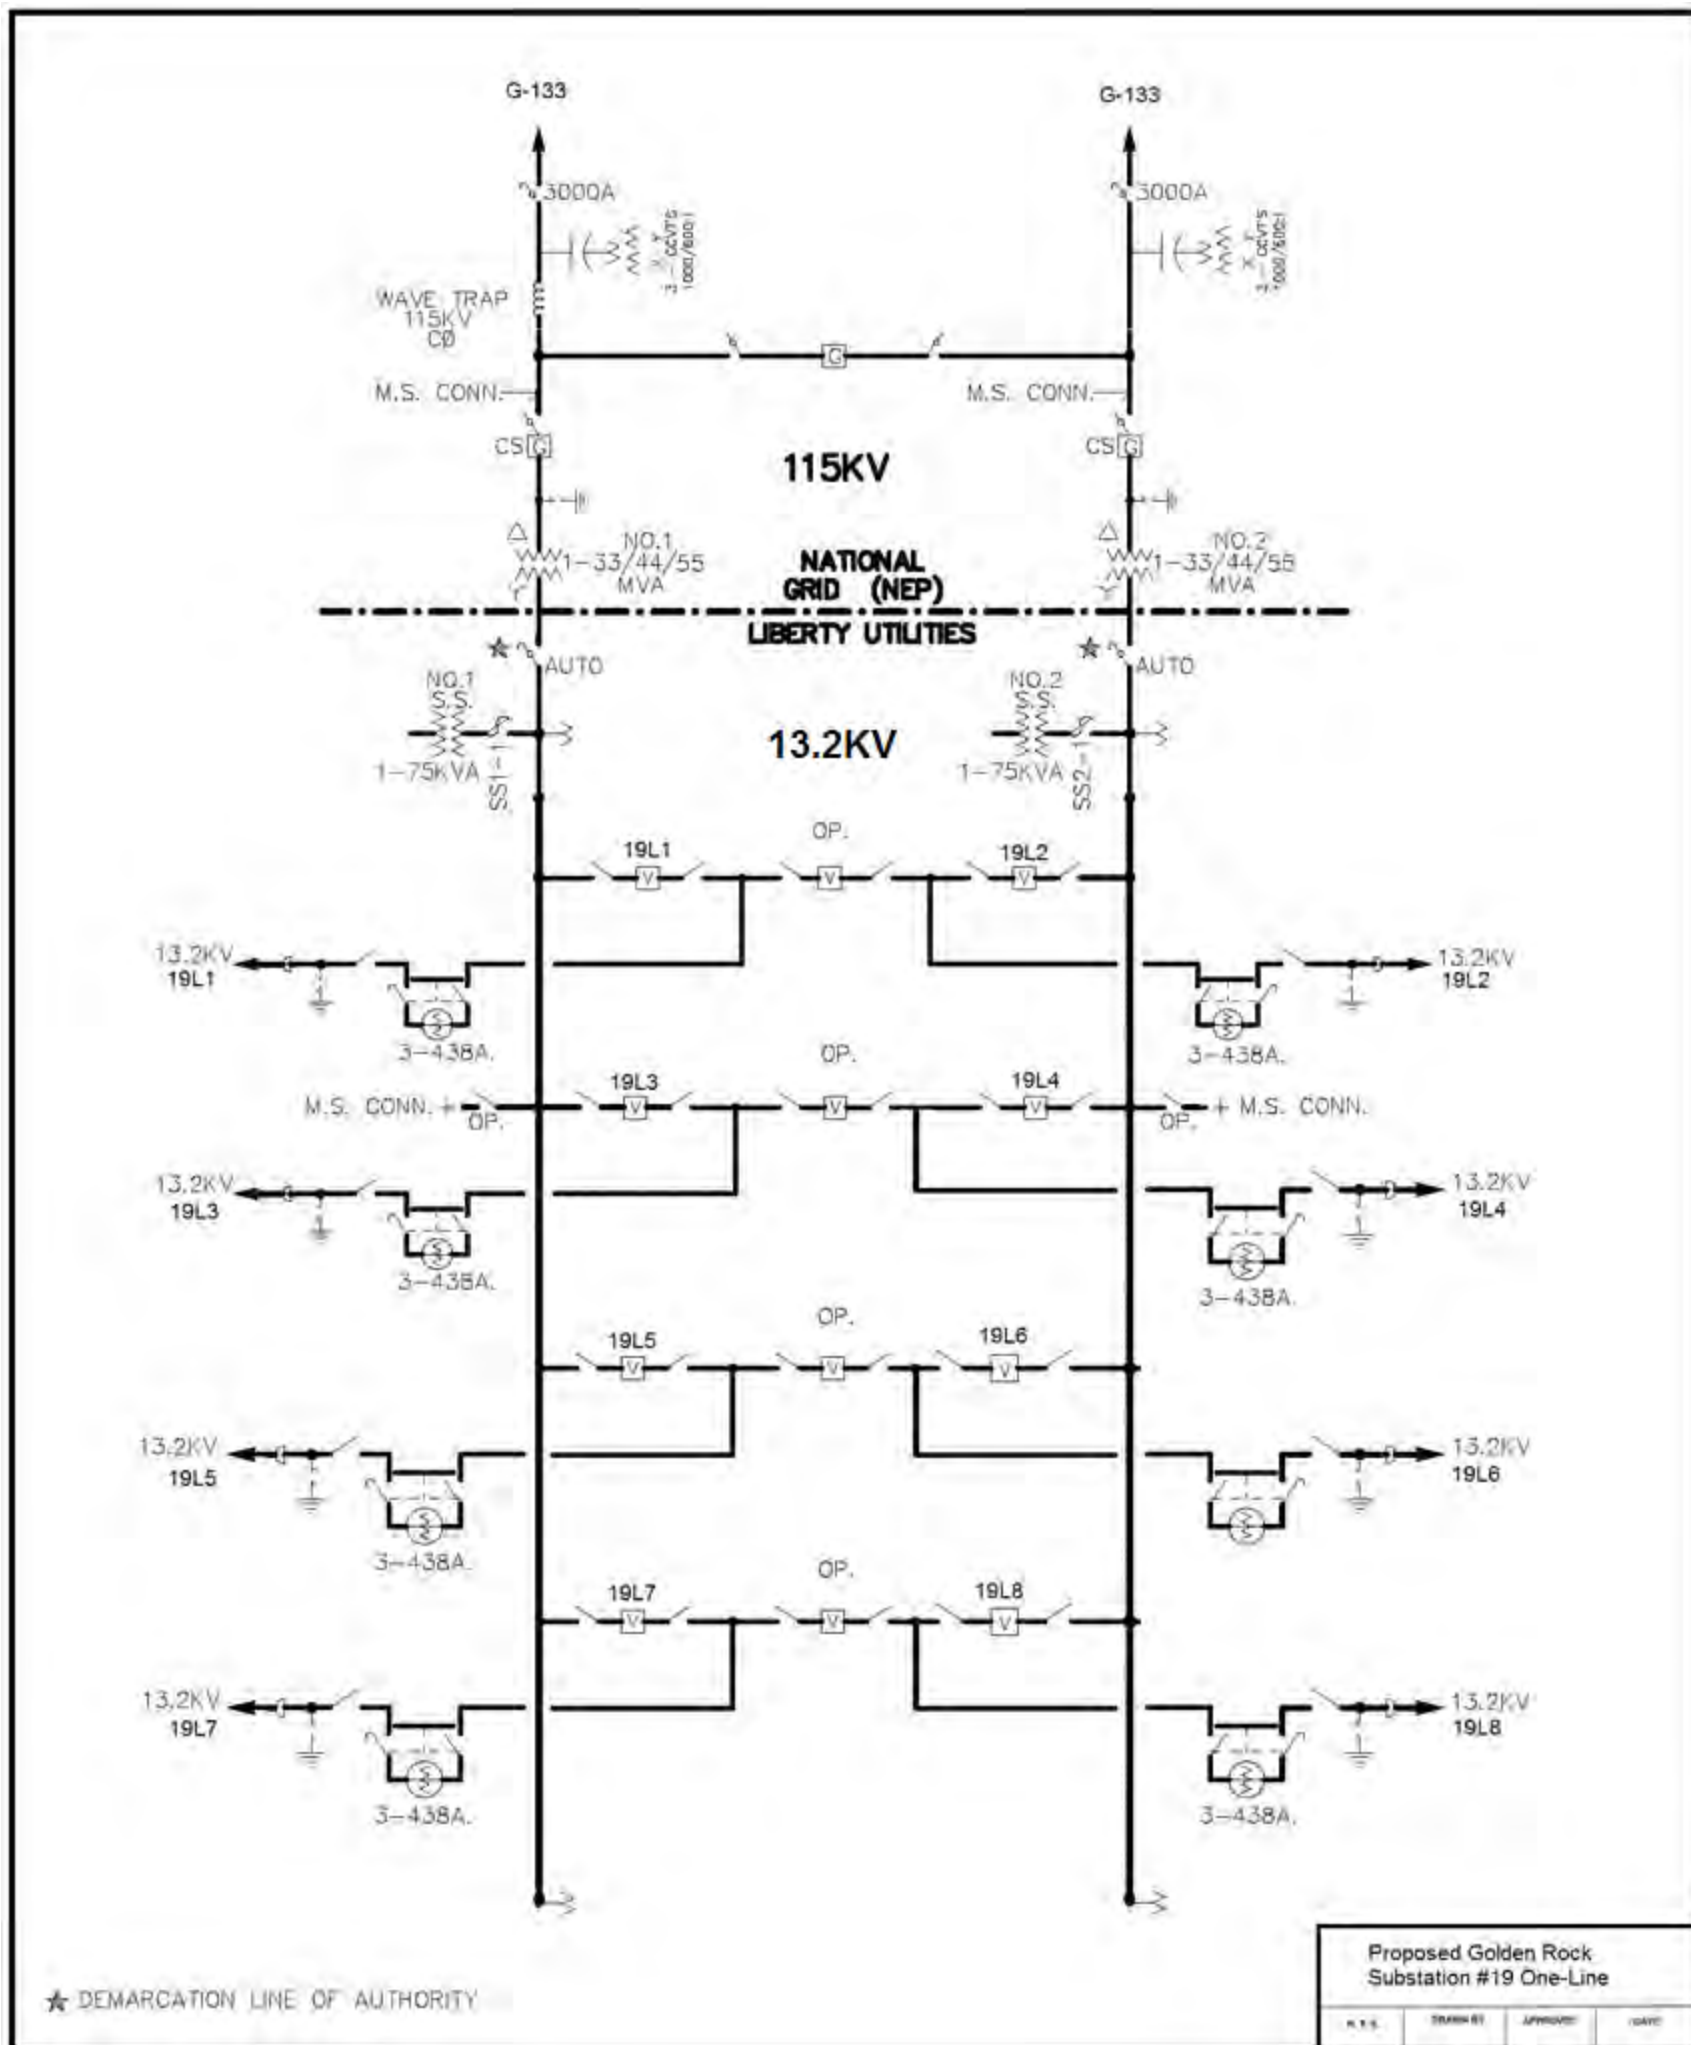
Recommended Plan Phase Three Proposed Golden Rock Station Proposed Layout
